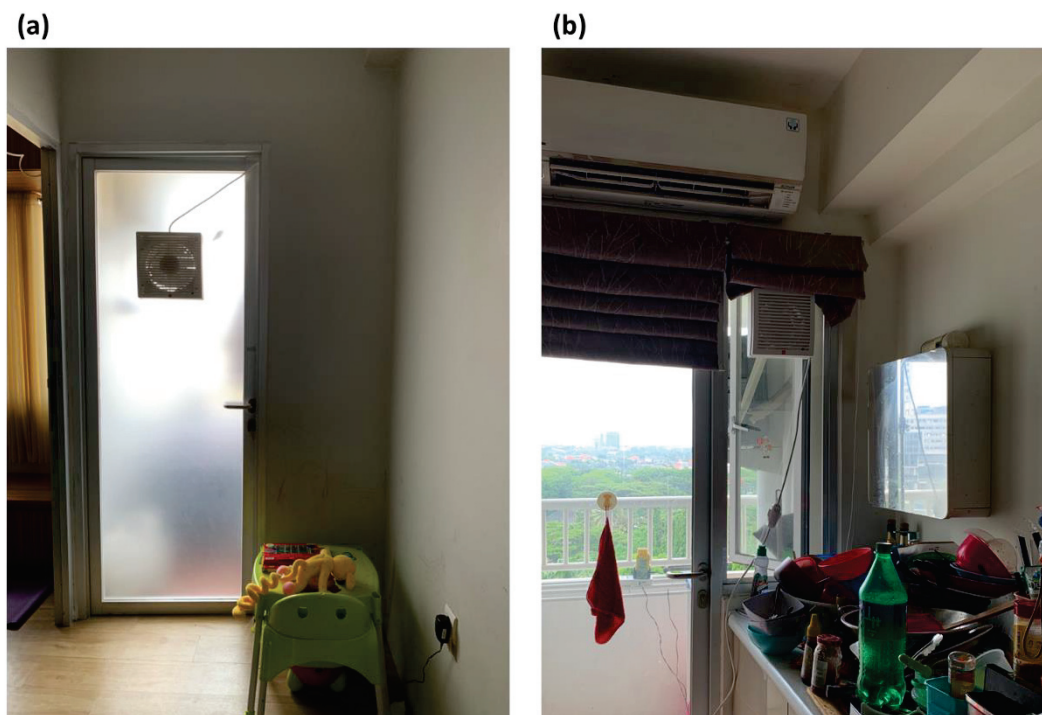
Exhaust fan installation on (a) the door and (b) windows of the unit
